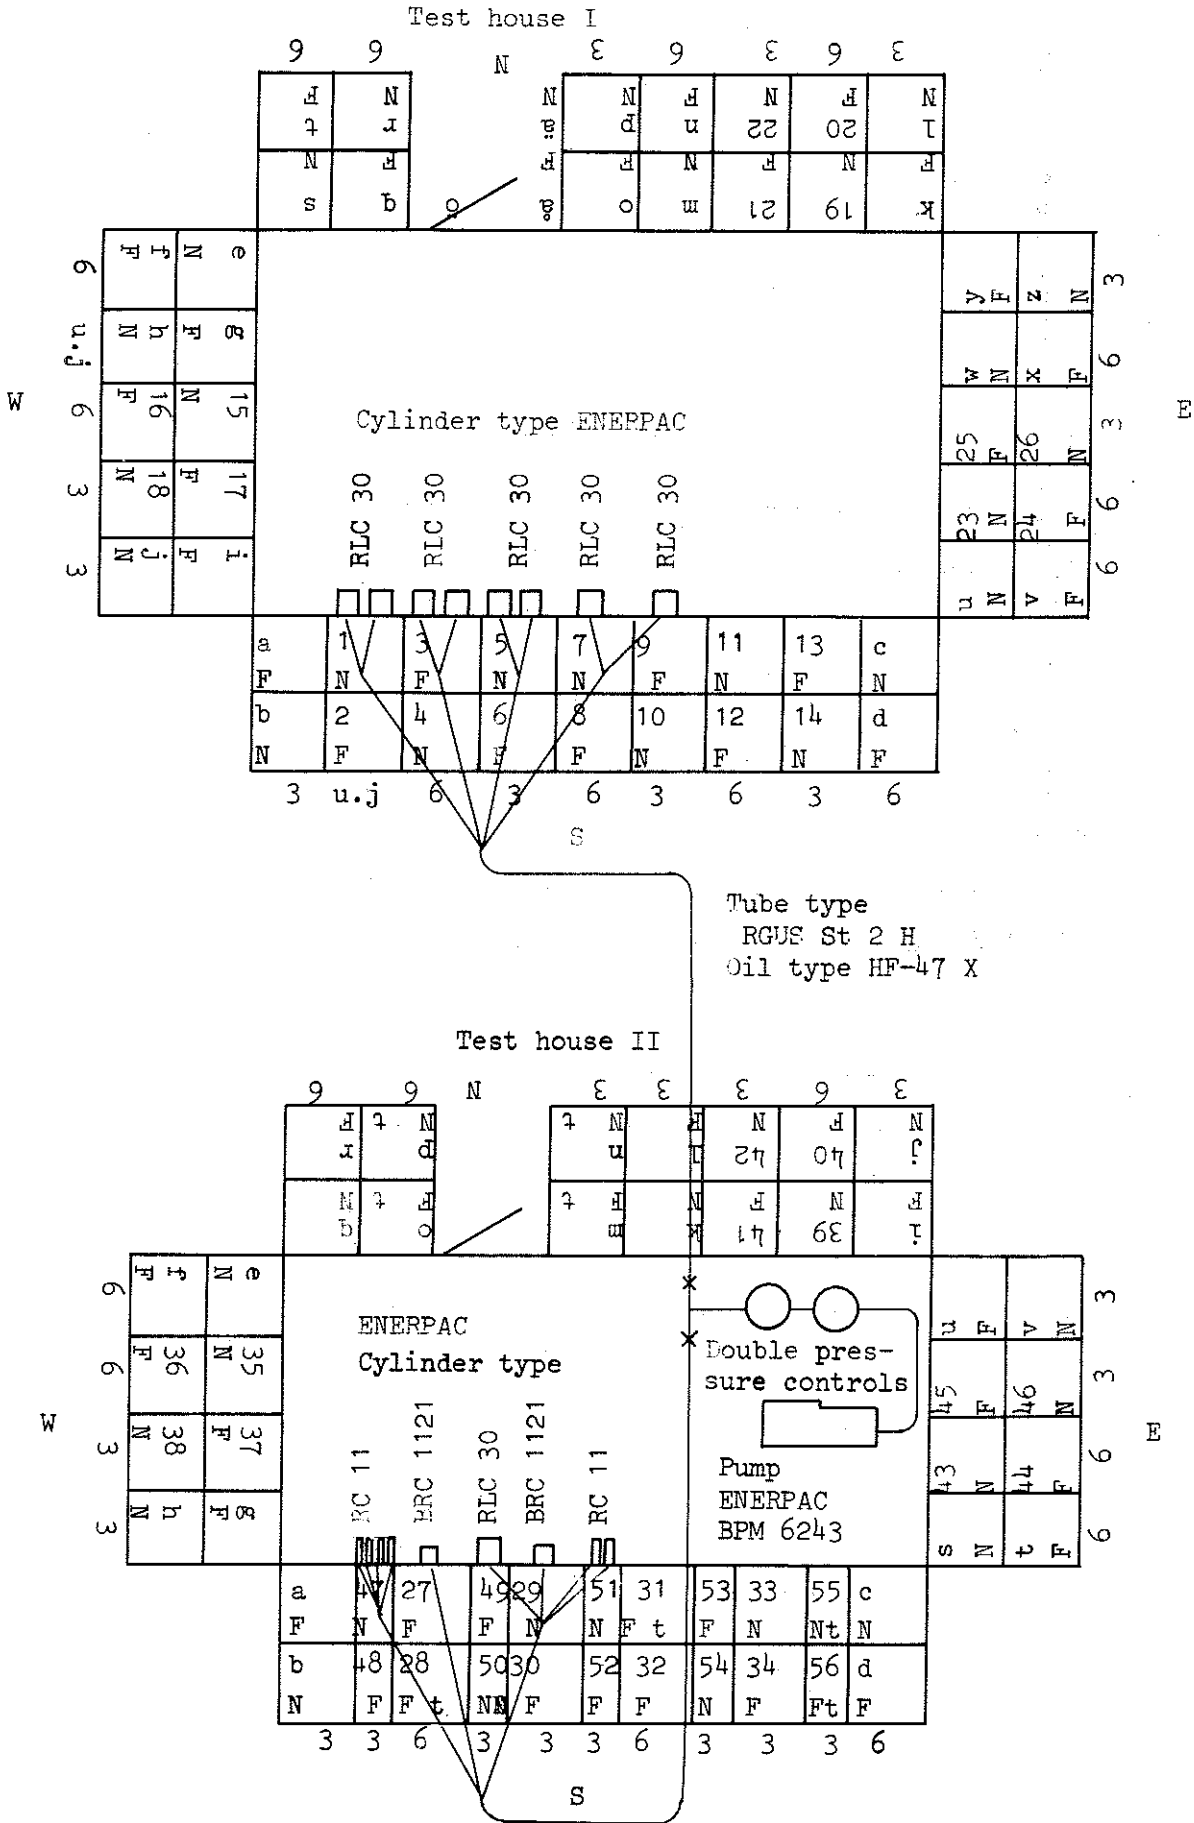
Survey of arrangements of different elements and joints. Hydraulic system for extra load on special wall and column elements, shown in unfolded position
